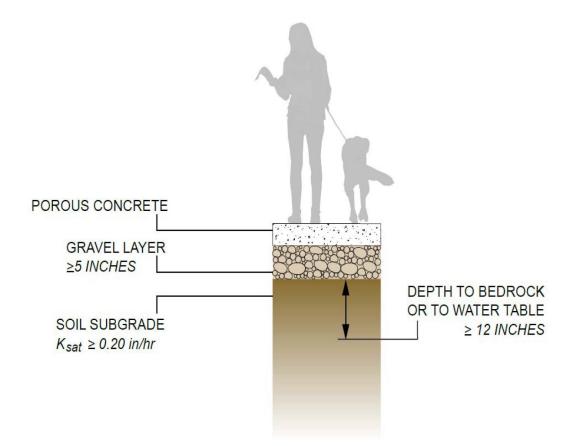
E-3 Typical Cross Section for porous concrete pavement.
